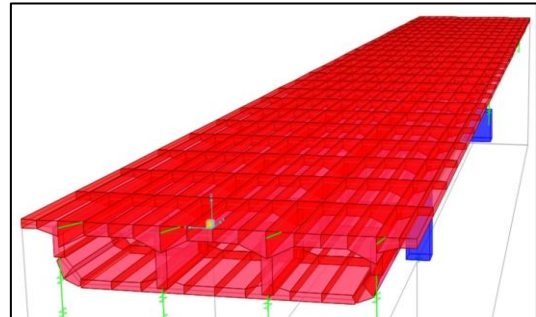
Multi Cell Box Girder of Exterior Girders with Radius
